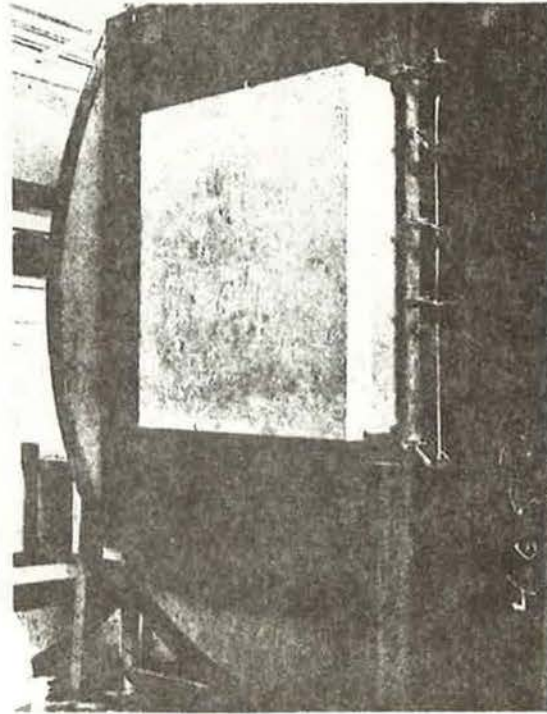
Roof Hatch Installed on Support Plate Showing Clamping Arrangement
